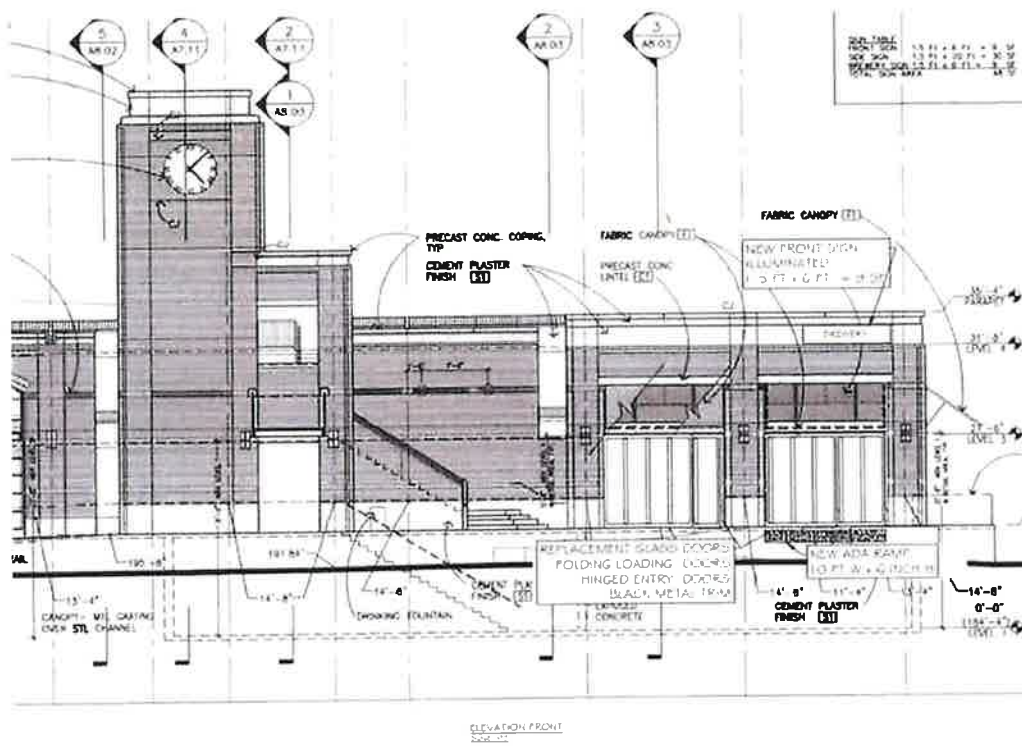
PROPOSED BUILDING ELEVATION (EAST ELEVATION)
